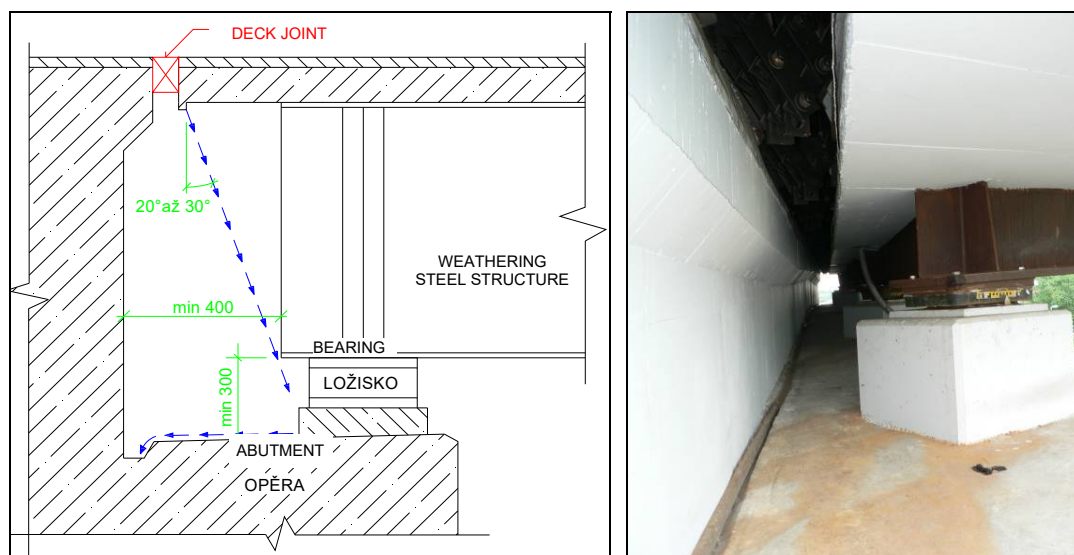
Acceptable completion of the load-carrying structure of the bridge next to the abutment (no corrosion treatment is necessary): left – recommended dimensions, right – a road bridge in Brno, Czech Republic (built in 2005)
